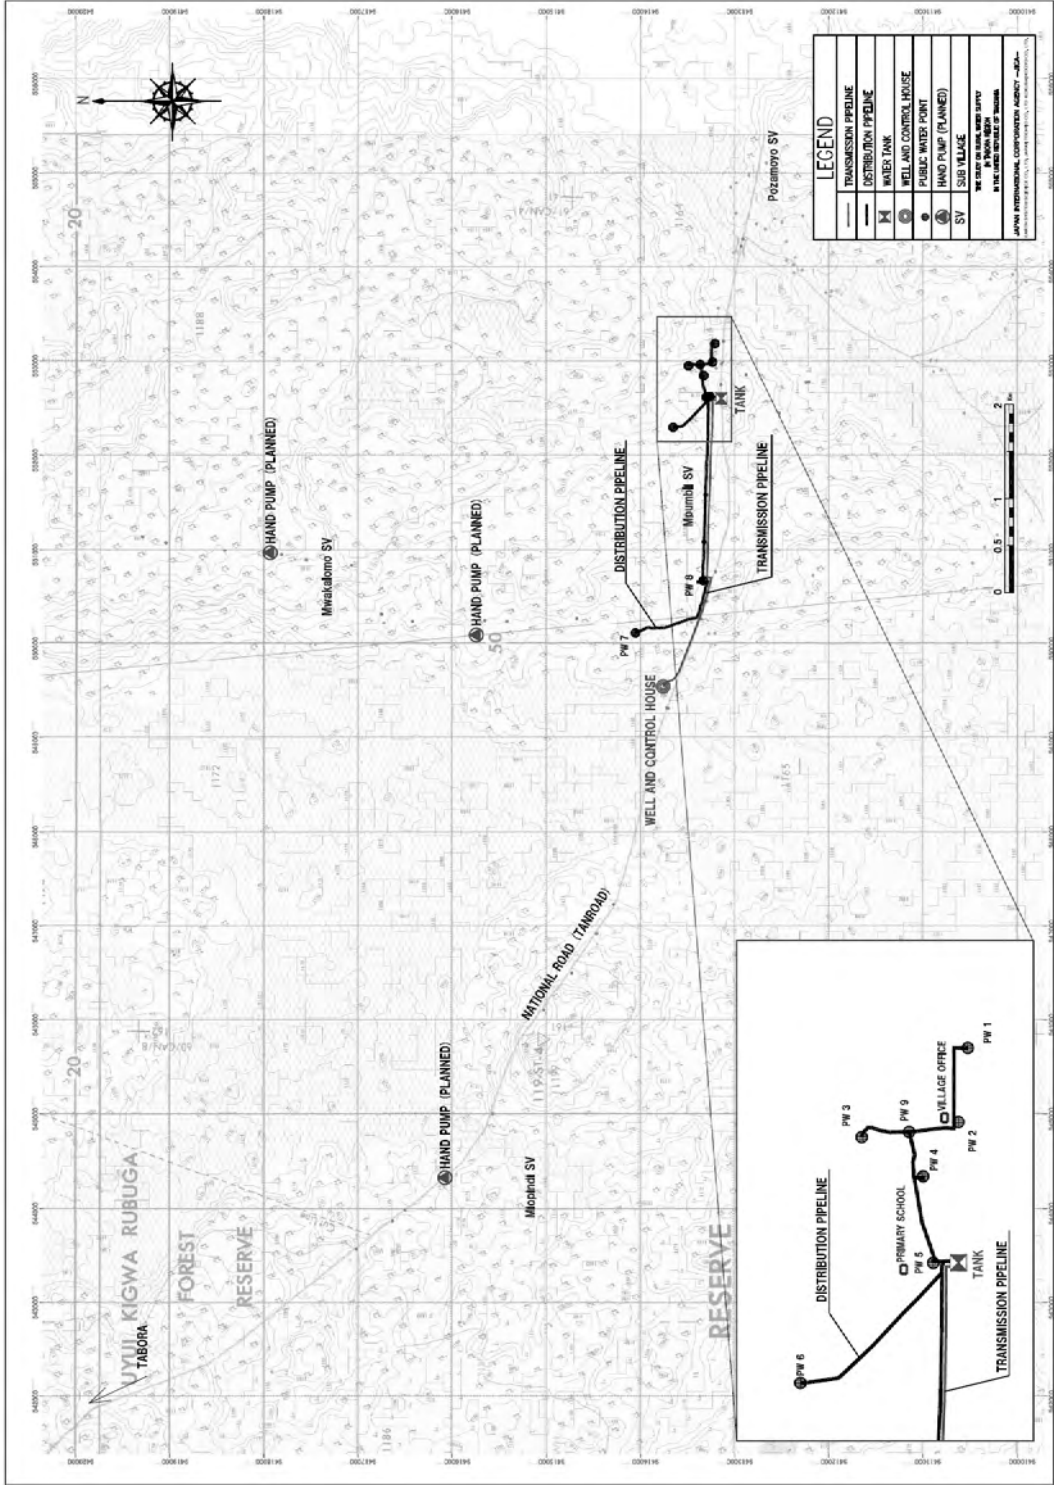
Layout Plan of Mpumbuli Village, Tabora Rural District
